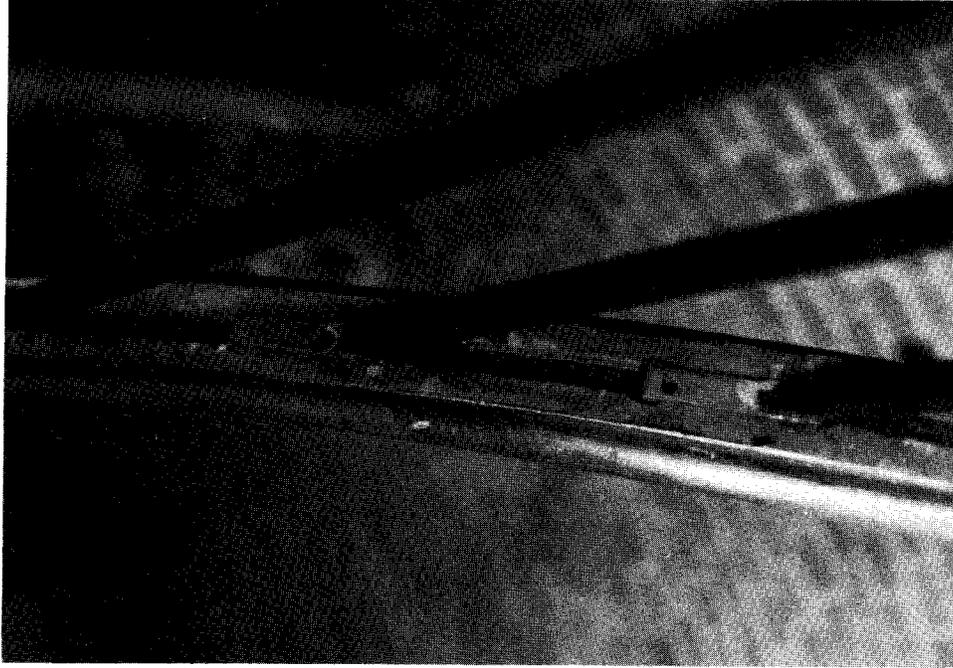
Room 112, underside of stair handrail at First Level of Tower, round holes at location of joint connector.
